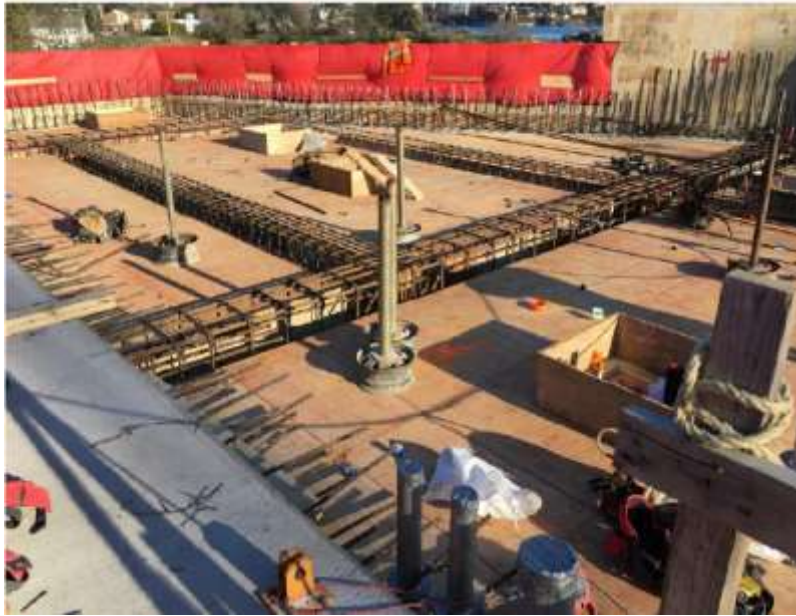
McLoughlin Point Wastewater Treatment Plant- Installing reinforcing steel for Odour Control Roof.
